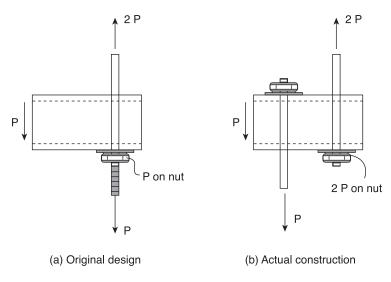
Configuration of hanger rods and the connection at the fourthfloor walkway according to the original engineering sketches (a) and actual construction (b). "P" represents the weight of an individual walkway. The configuration shown in (b) doubles the weight supported by the nuts on the underside of the fourth-floor walkway.
